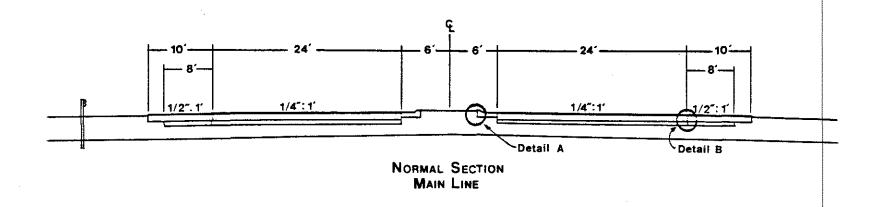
Typical Section and Detail for Main Line Section STA 0+00 to STA 166+00 (Section A).
